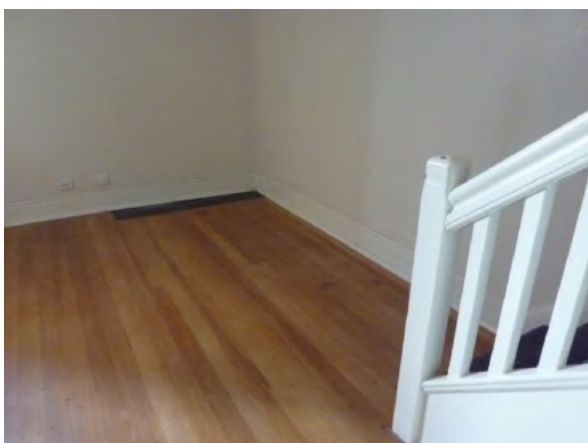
Dining room (space LG.1) showing the original fireplace with concrete hearth, boarded up, timber floor and the cement run skirting—50 / 46–56 Gloucester Street. (Source: GML Heritage, June 2016)
